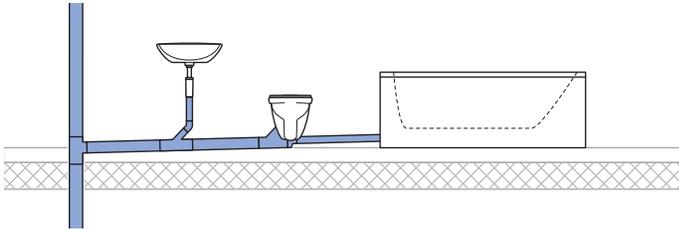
Laying the branch discharge pipe above the ceiling, single stack
